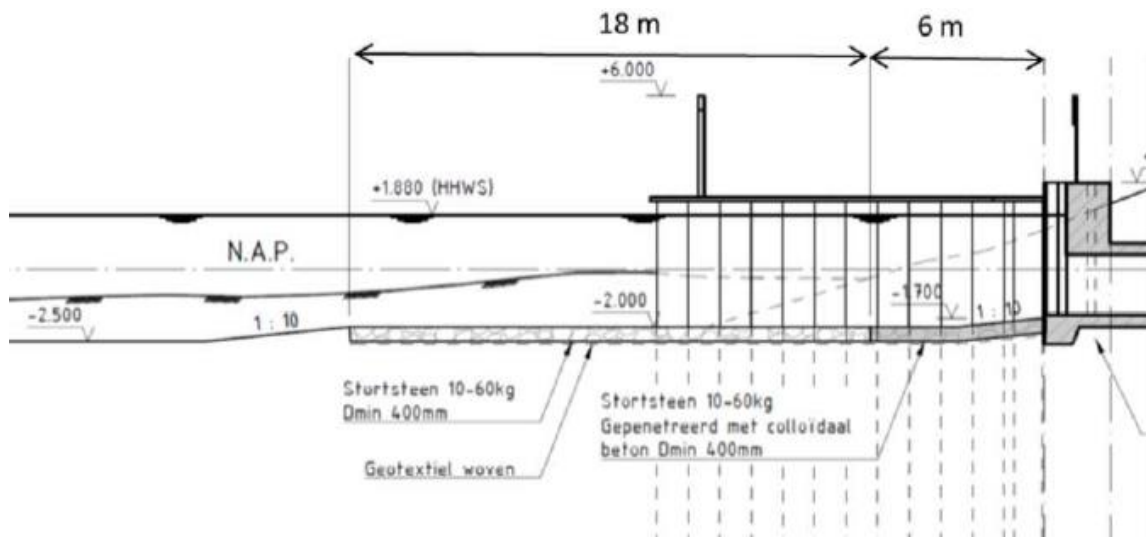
Longitudinal section of the outlet structure with a 24 m long bottom protection.
